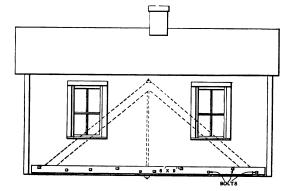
Side Elevation of Building, Showing How 6 x 9's Were Applied.—Dotted Lines Show Proposed Truss, Which Was Not Neccessary.—Scale, 1% In. to the Foot.
